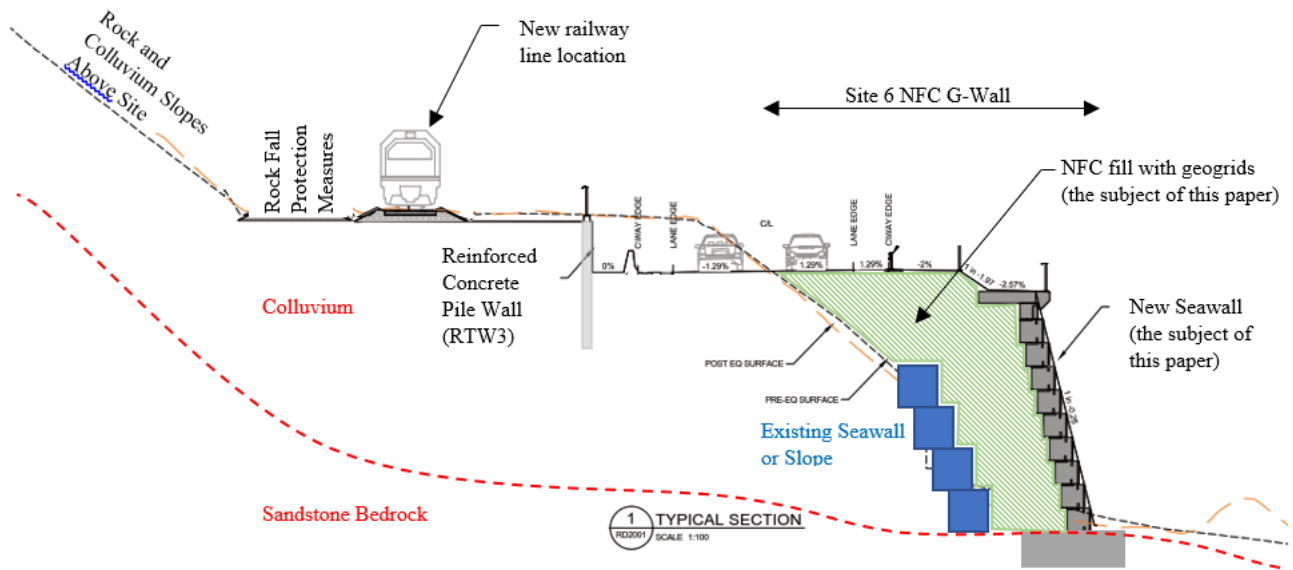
Typical cross section through the Site 6 NFC G-Wall, SH1 and railway line
